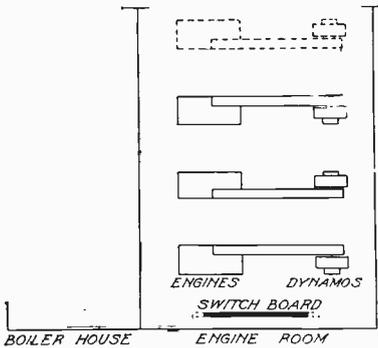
Diagram of Simple Arrangement of Belted Machines
